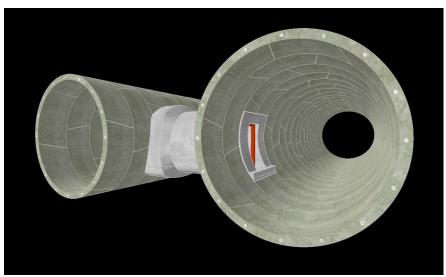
Example of a 3D Rendering of a Cross Passage between Two Running Tunnels for a Subway (Northlink, Sound Transit)
